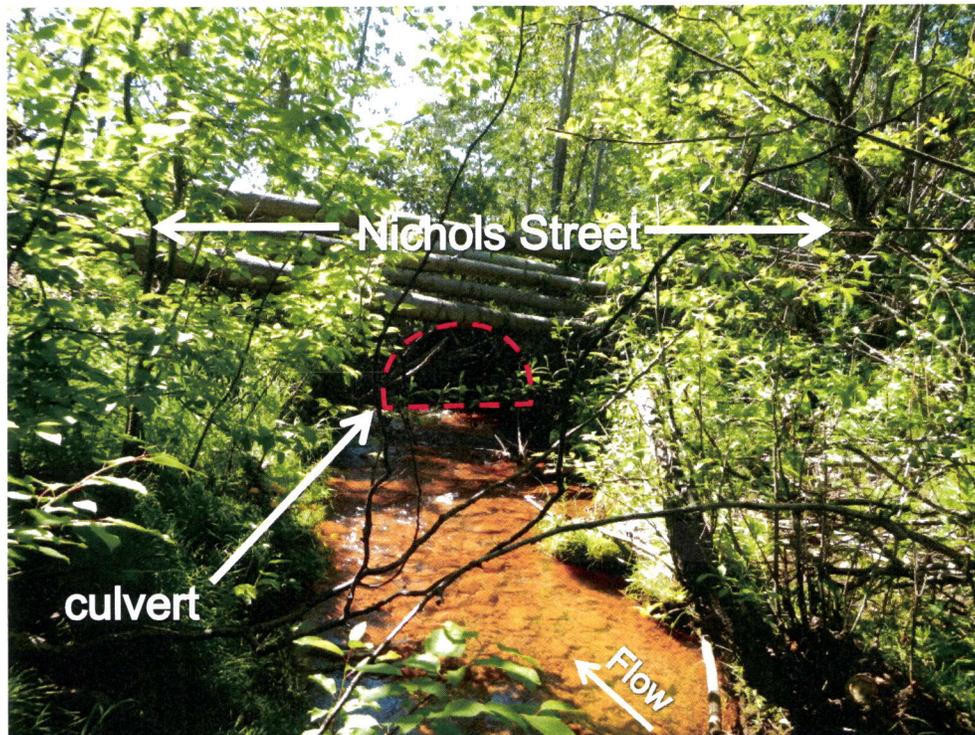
Middle Fork Chester Creek looking downstream at Nichols Street culvert inlet. Photo was taken from vicinity of Minnow Trap 1 location.
